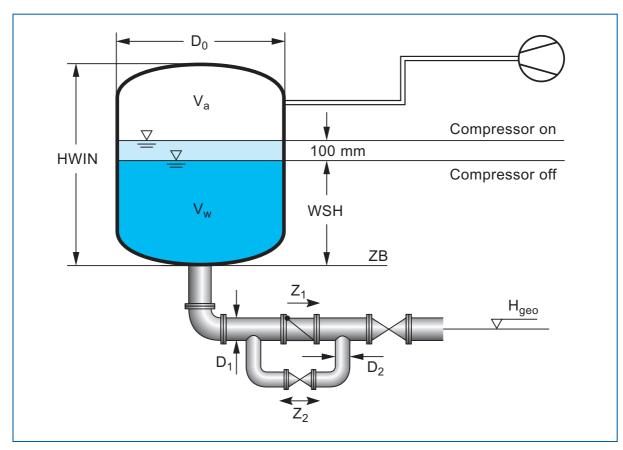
a: Schematic layout of a compressor-type air vessel. To avoid excessive pressures on return of the vessel water, the connecting pipe may have to be fitted with a swing check valve with a throttled bypass.
